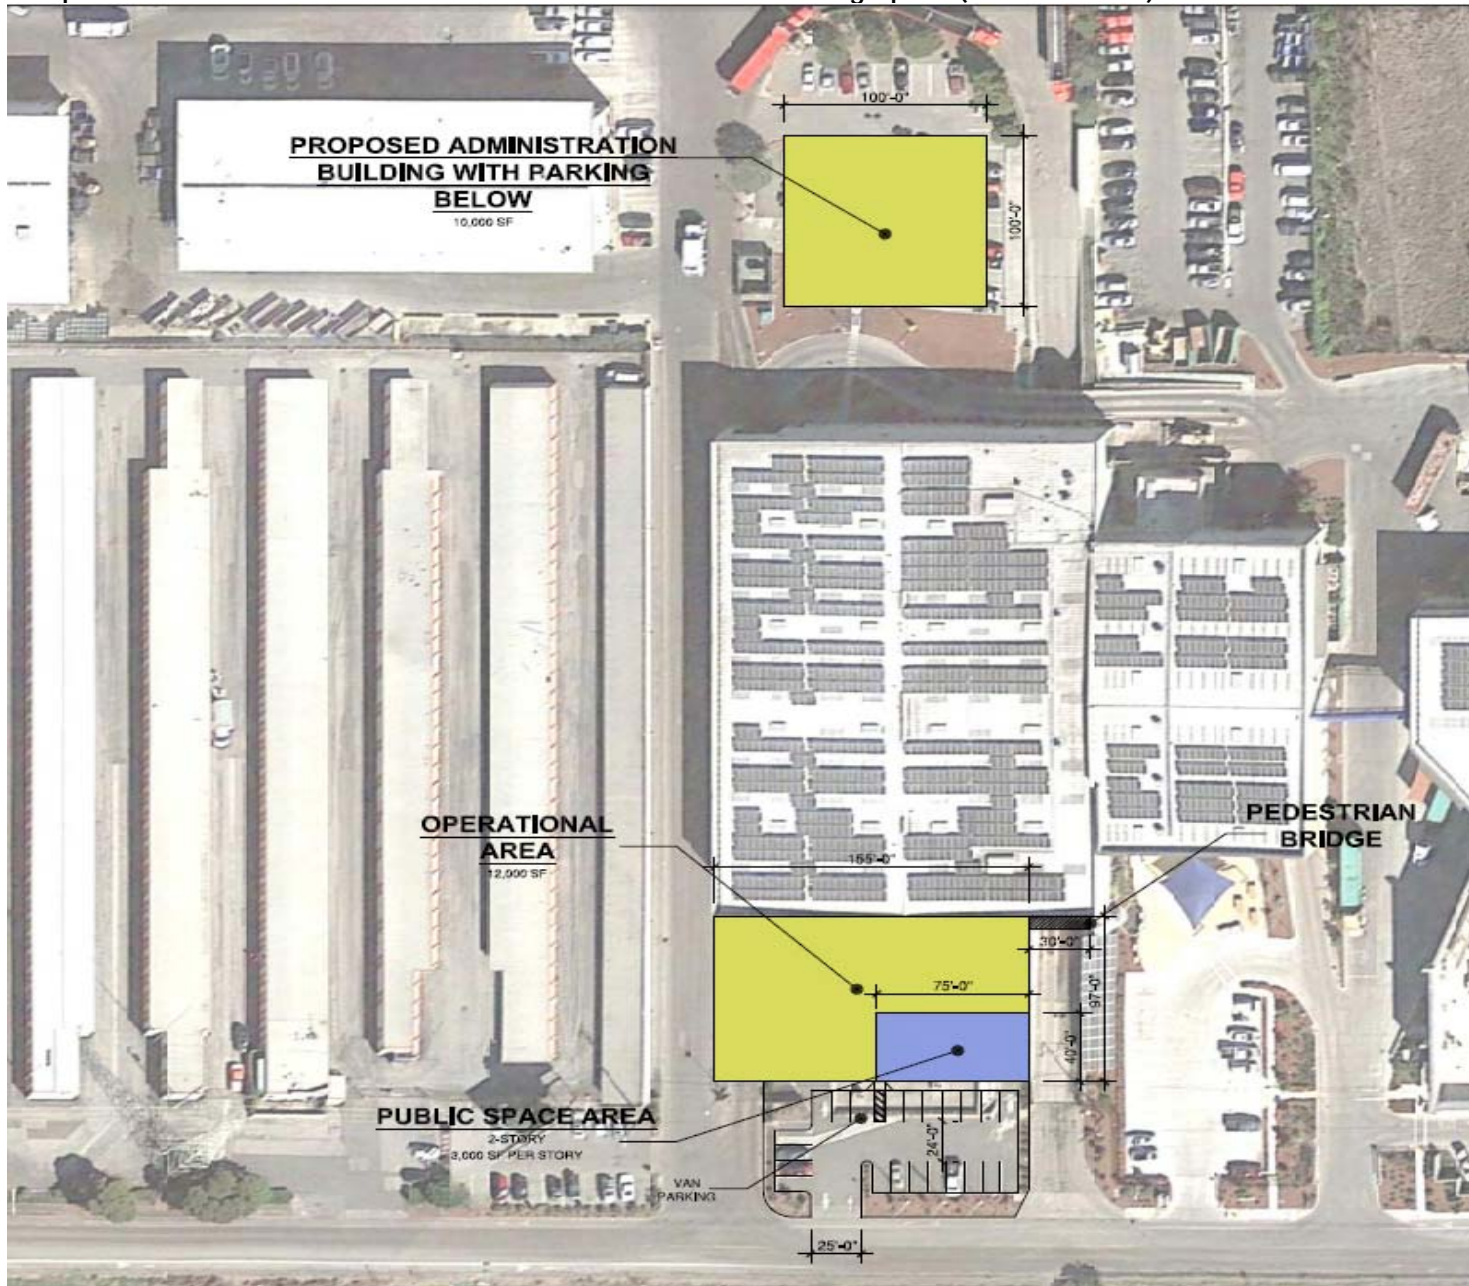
Rendering of Shoreway MRF Tipping Area Extension and Site Plan with Construction Location Shown
